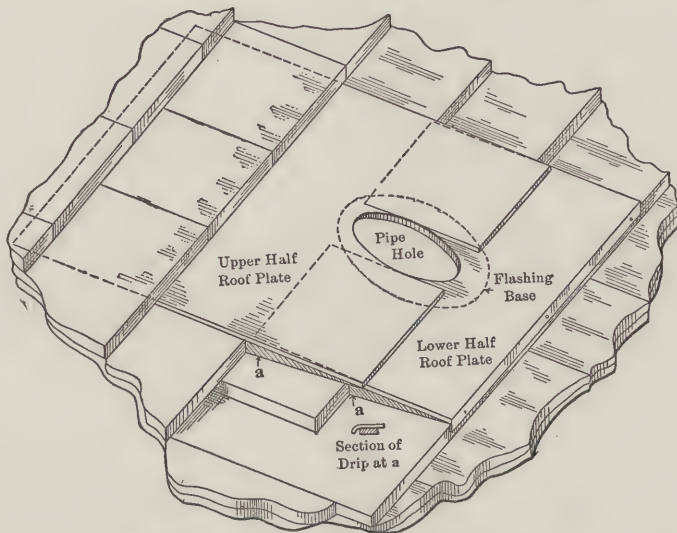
FLASHING A PIPE AFTER ROOF IS ON
